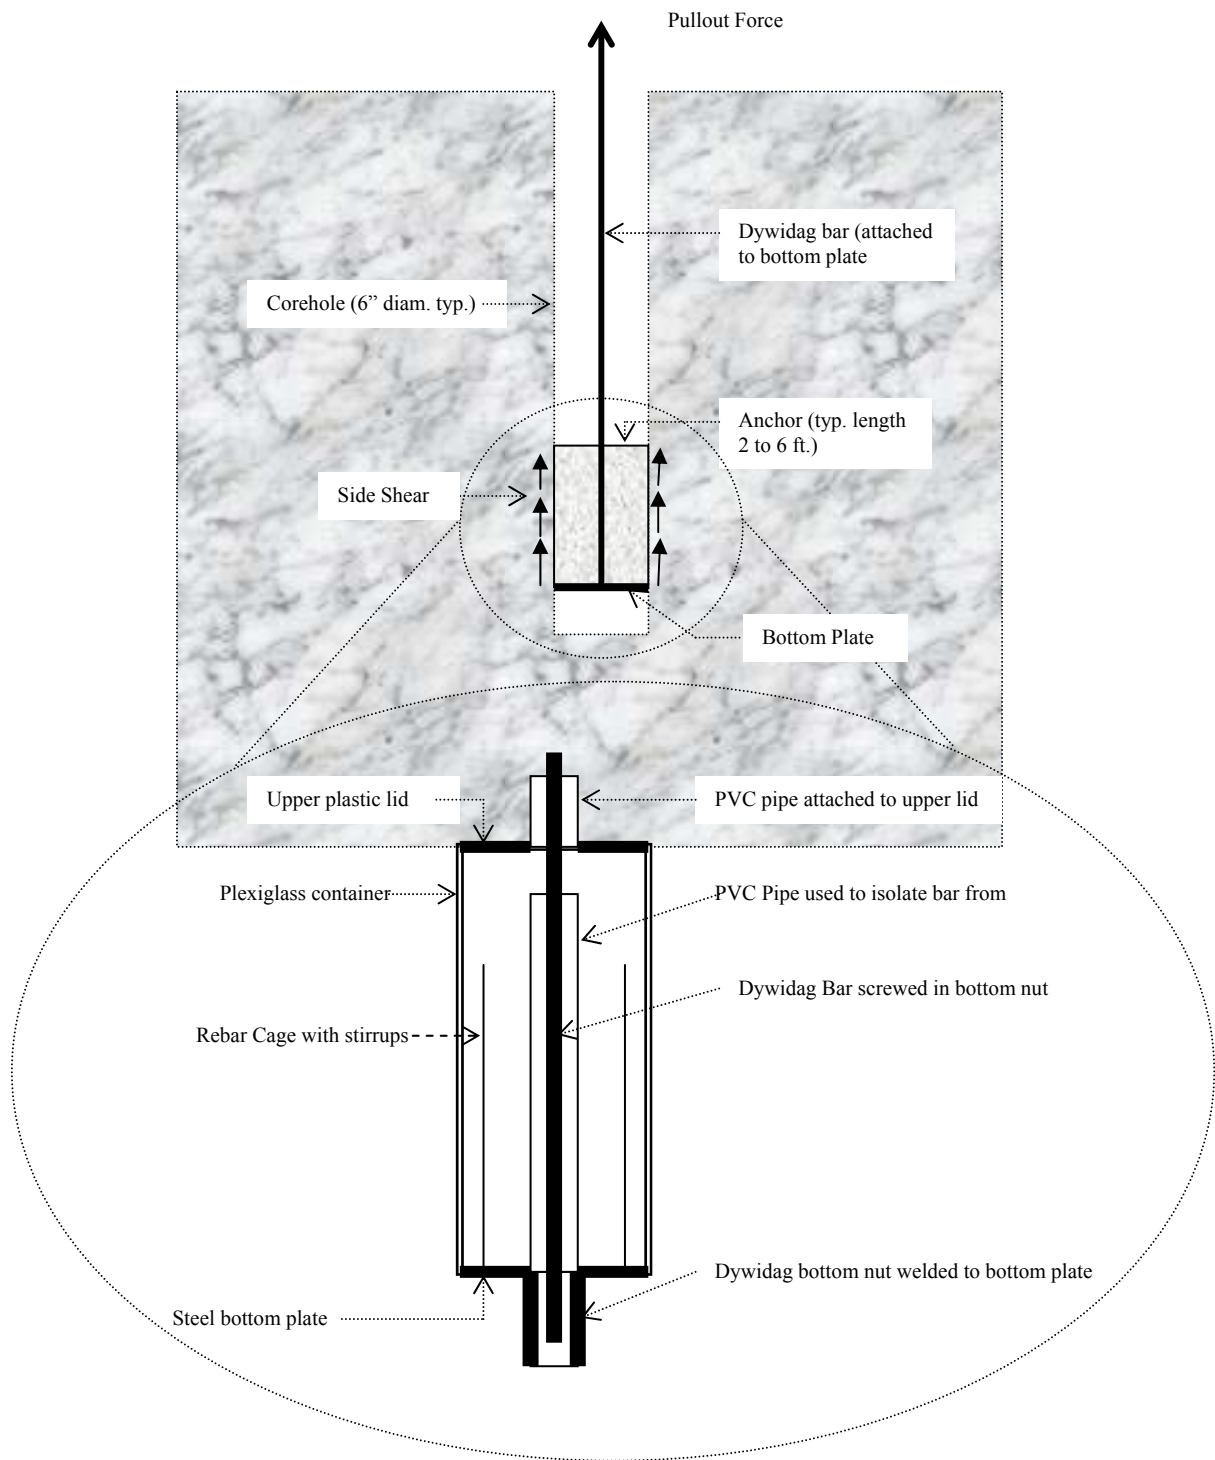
Schematic of Pull-Out Test Setup and Anchor Casting Detail (Parra, et. al., 1990)
